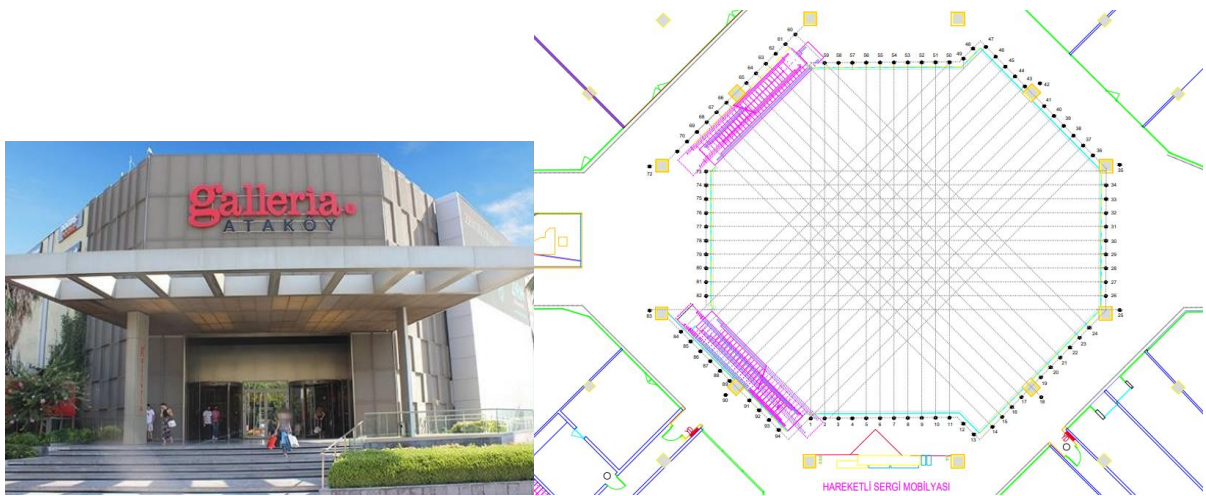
Galleria Shopping Mall Front Facade View and Ground Floor Common Circulation Area Measurement Points
